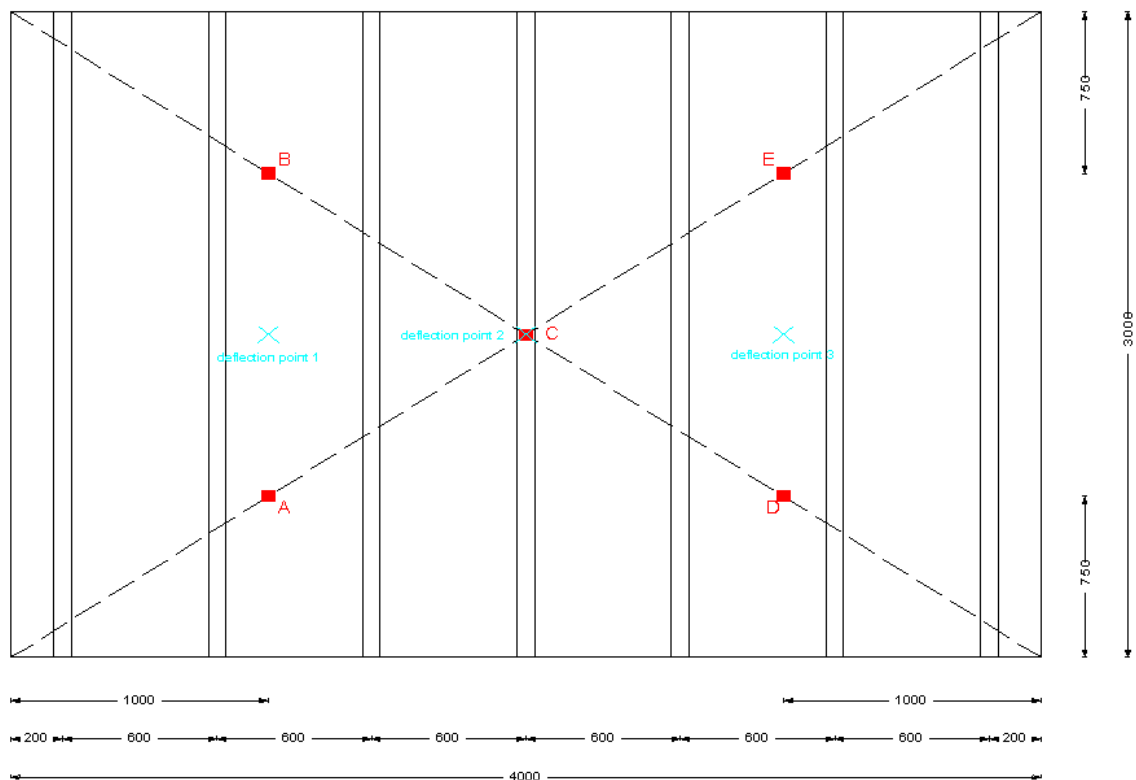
Plan view of floor/ceiling showing thermocouple and deflection locations in the main furnace test
